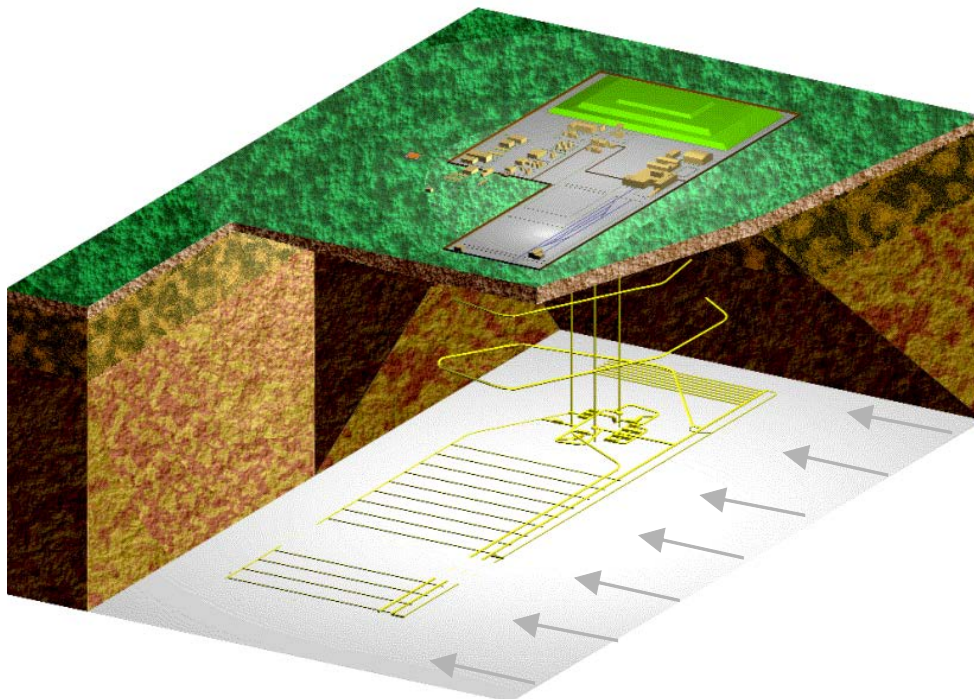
ENRESA repository concept: underground installations (ENRESA, 2005).
